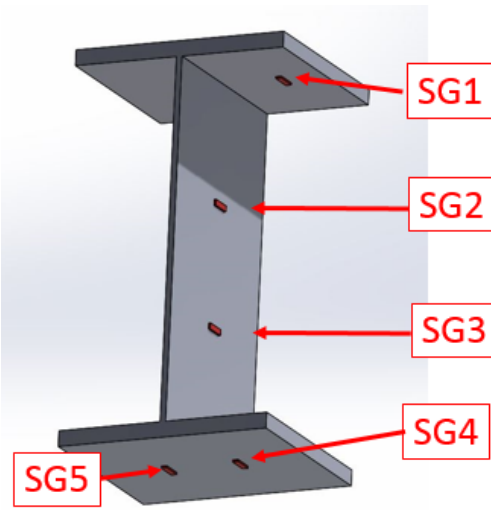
Main Girder Strain Gauge Locations and Nomenclature.
